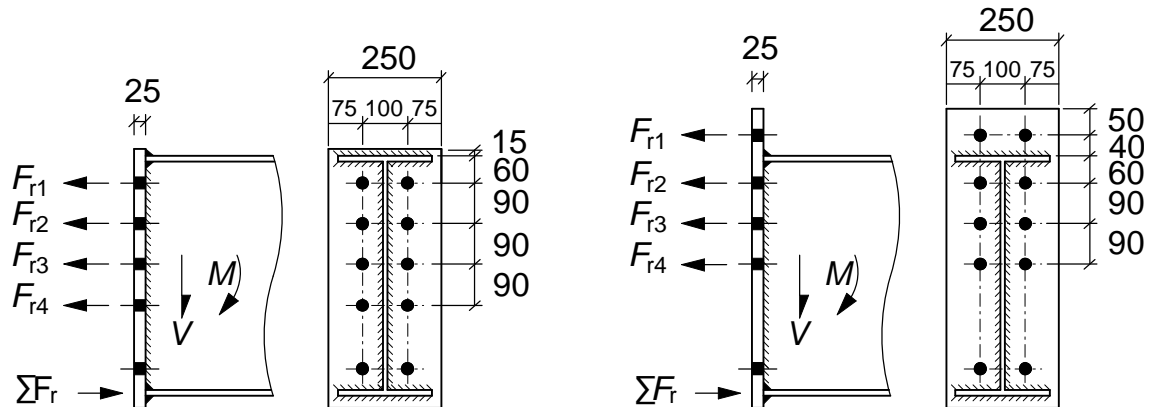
Recommended connection details for beam sizes 533 UKB and above
